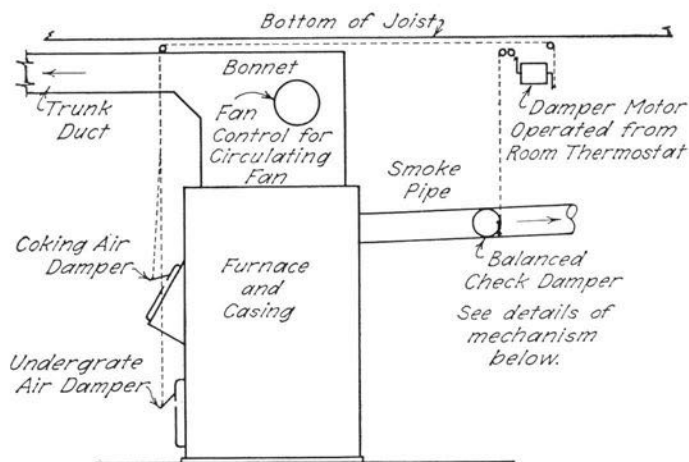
ARRANGEMENT OF COMBINED CHECK DAMPER AND DRAFT REGULATOR
